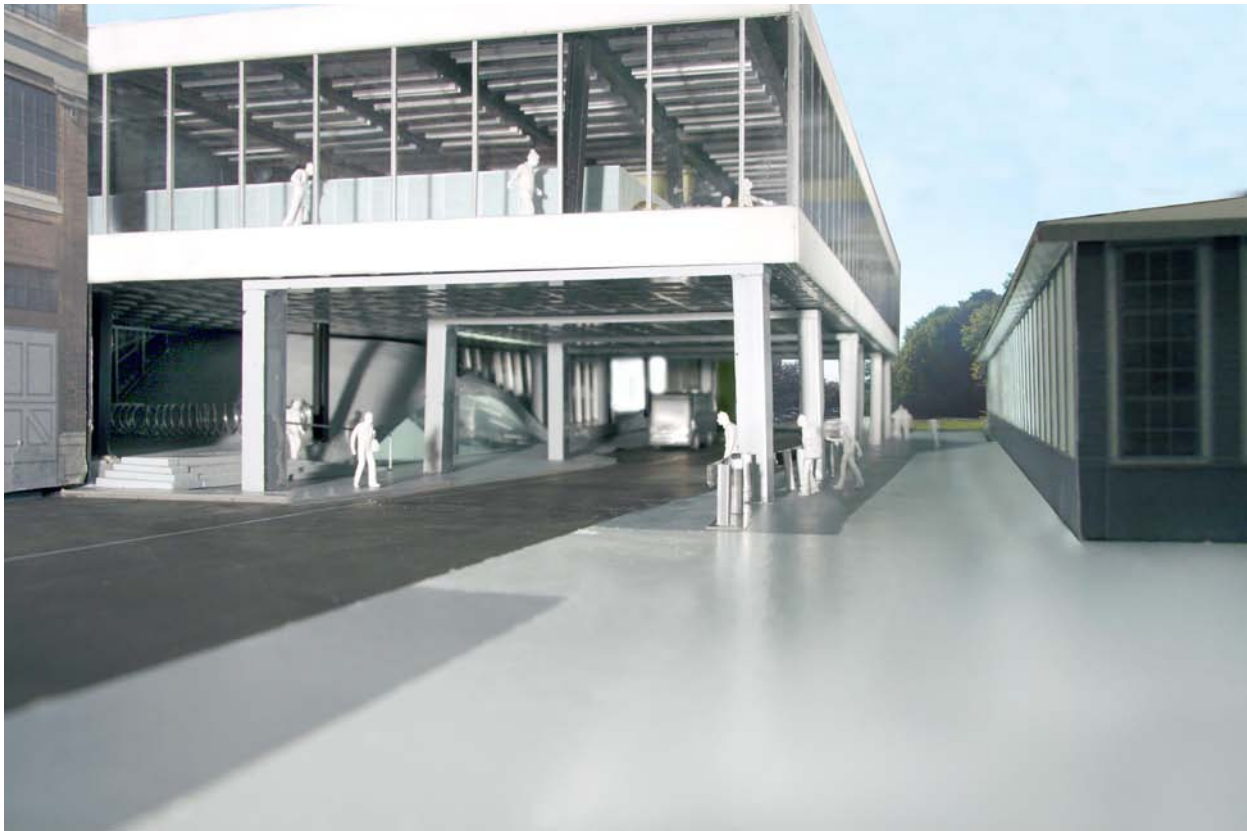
Model view looking west, previous OMA design plan with columns and guardrails.
